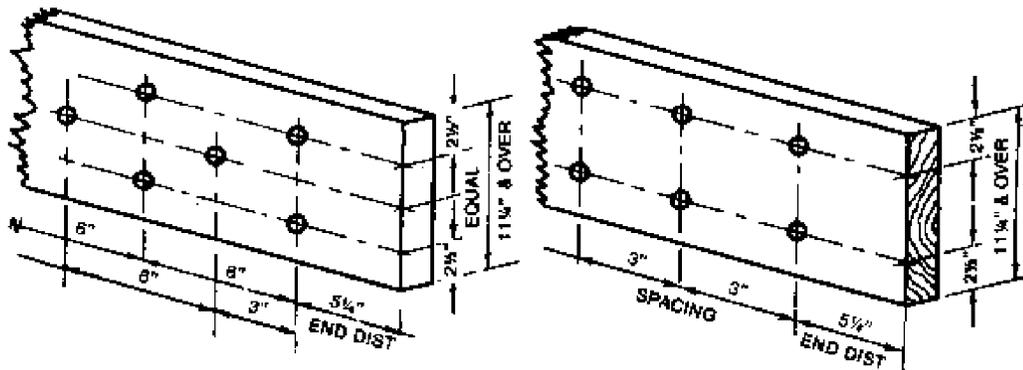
BOLT CONNECTIONS (IN USE PRIOR TO 1970).
